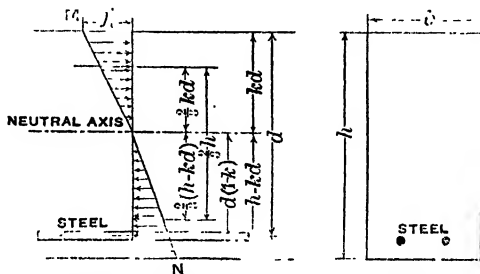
Resisting Forces with Concrete Bearing Tension. (See p. 760.)
